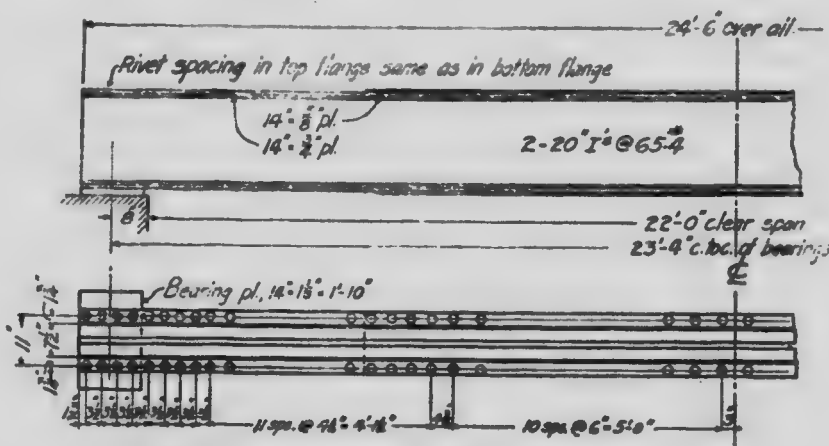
DETAIL OF 22-FT. BOX GIRDER
